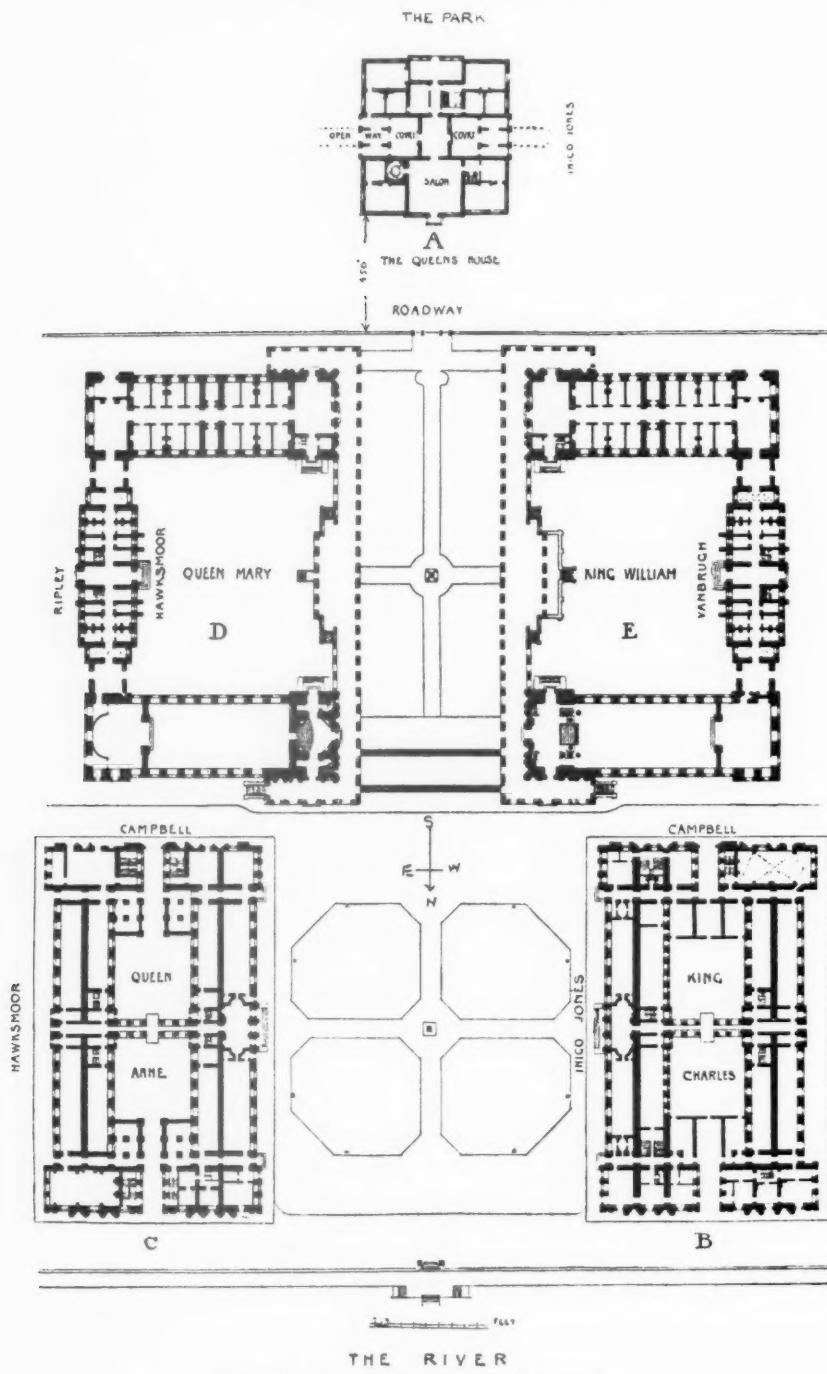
PLAN OF GREENWICH PALACE (AS EXISTING).
